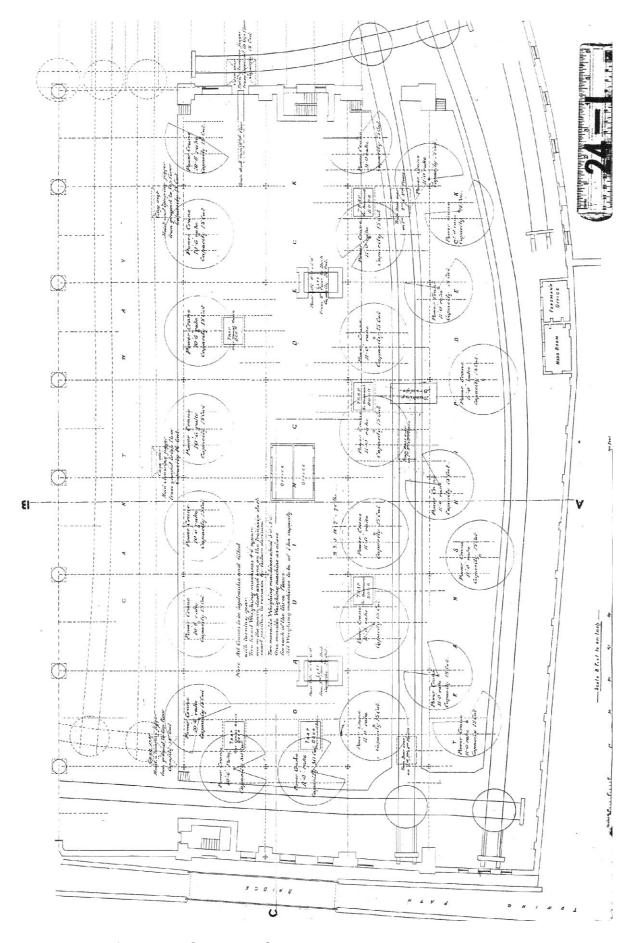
Plan of showing Cranes at Ground Floor, 1902
